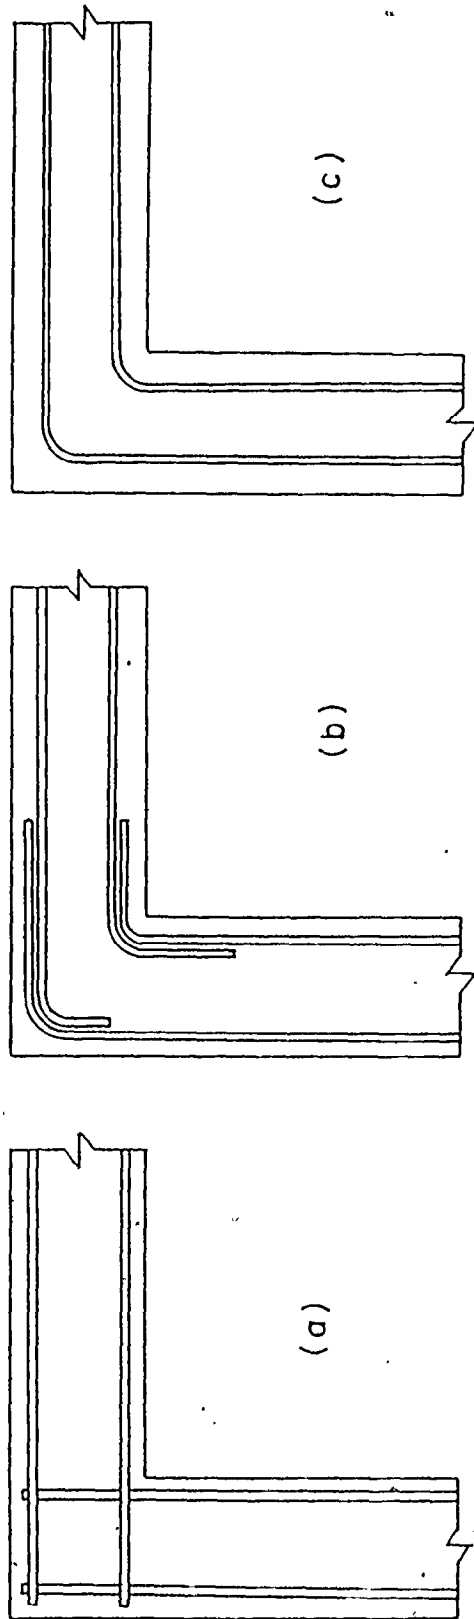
DETAILS OF CORNER CONNECTION-REINFORCEMENT
